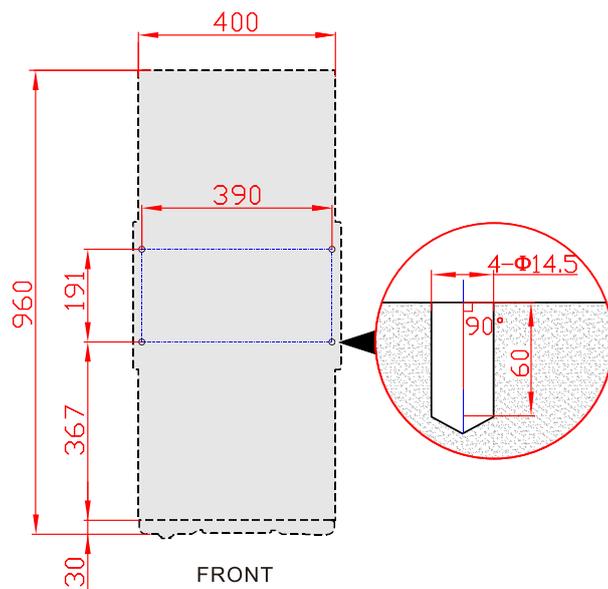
Bottom installation size (bottom view of pedestal)(unit: mm)
